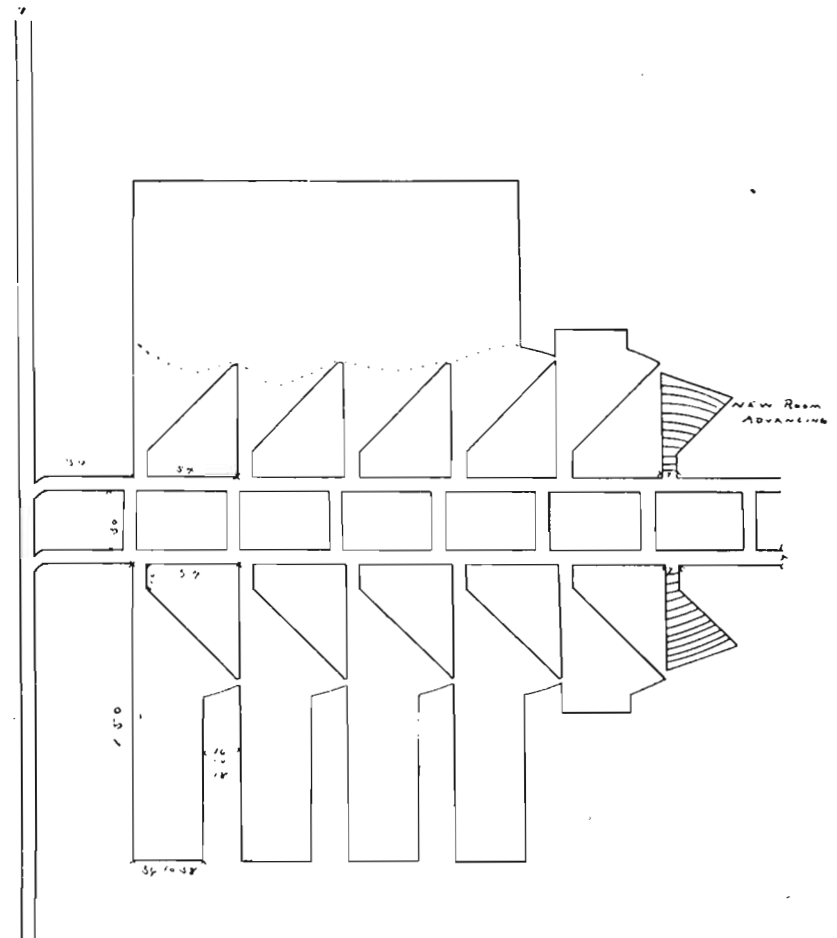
PLATE XCIII (Fig. 3). Plan of double room with one neck widened at 45° angle.
